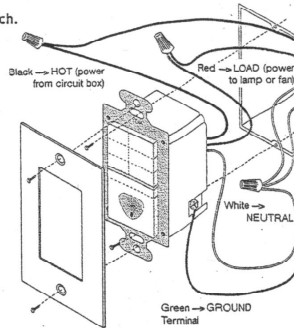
Switch Orientation, Wire Connections and Wall Box Assembly
